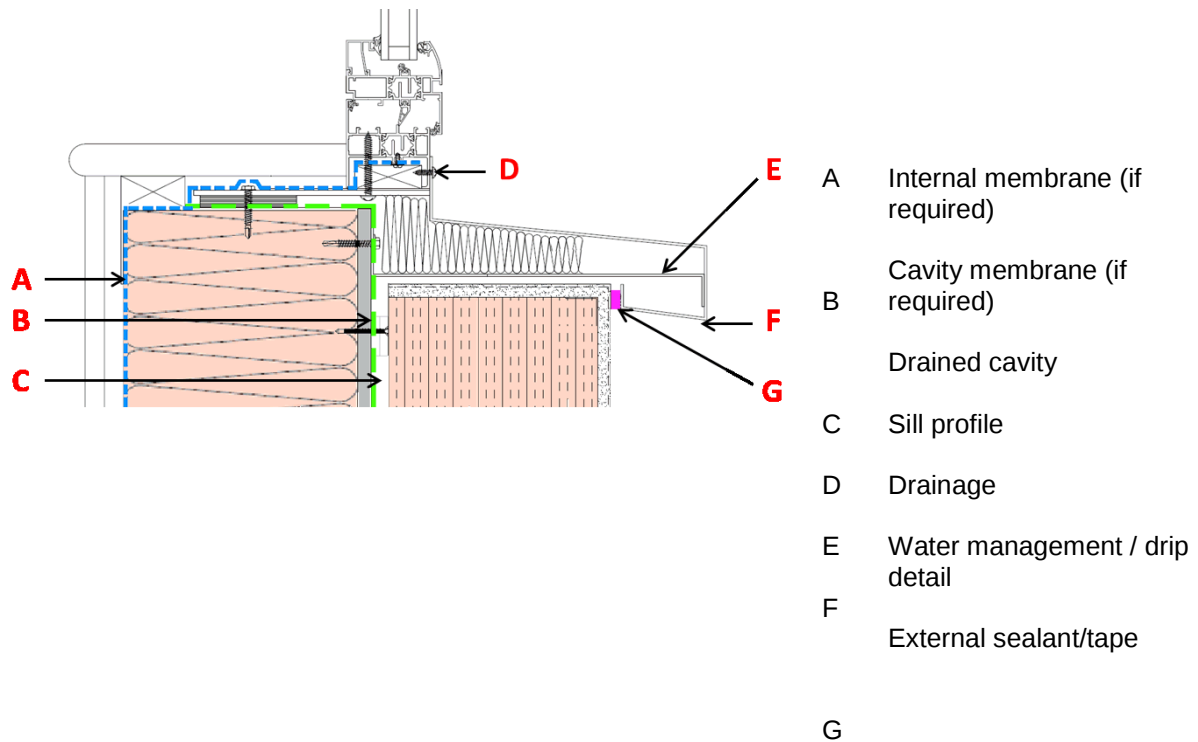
Window sill interface with EWIS, framed back wall (insulated)
